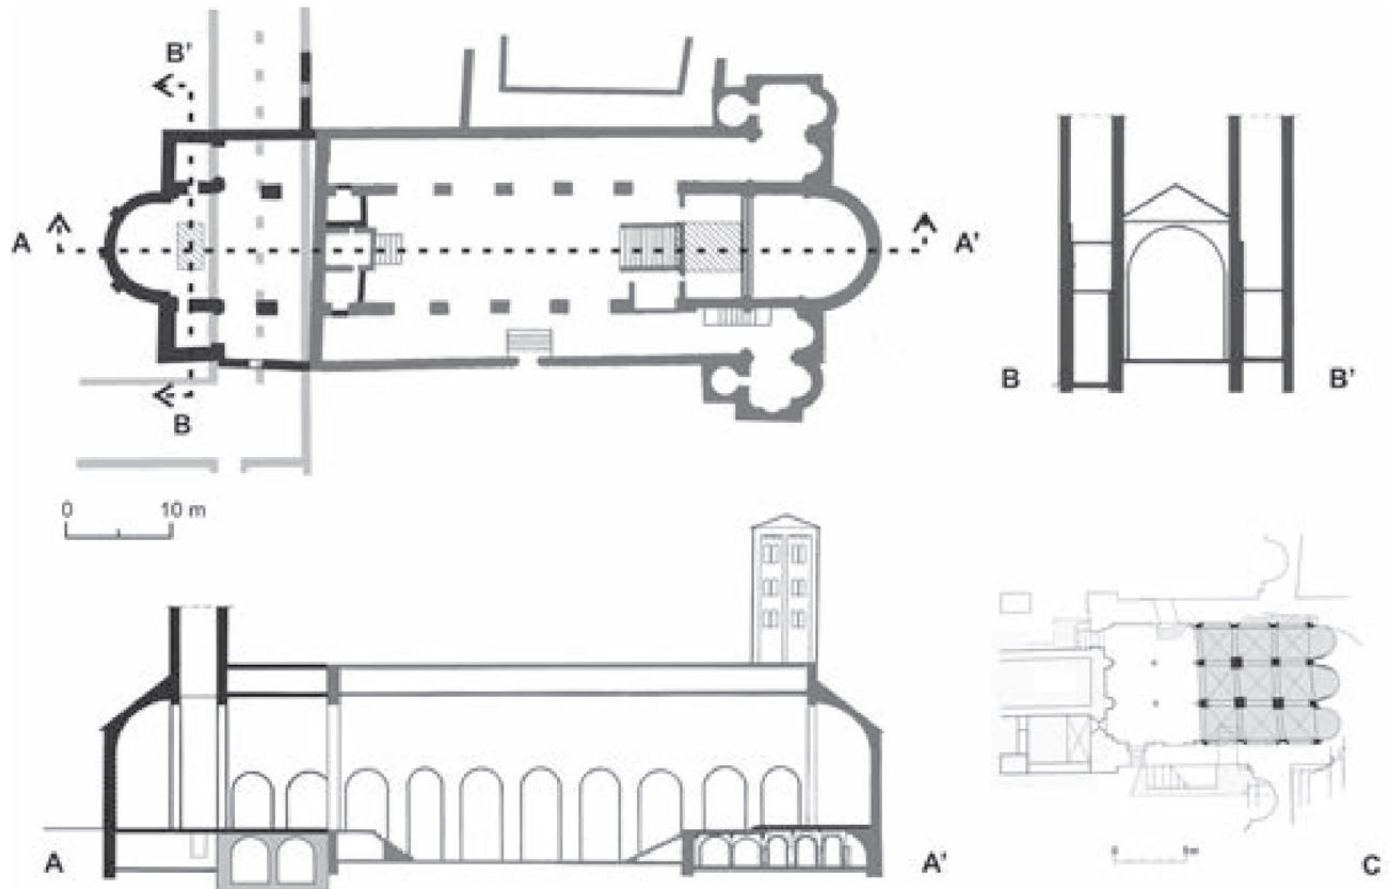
Aosta Cathedral in 1064: plan, sections and plan of the crypt (C) (drawings Mauro CORTELAZZO & Renato PERINETTI) (Plate 3)
